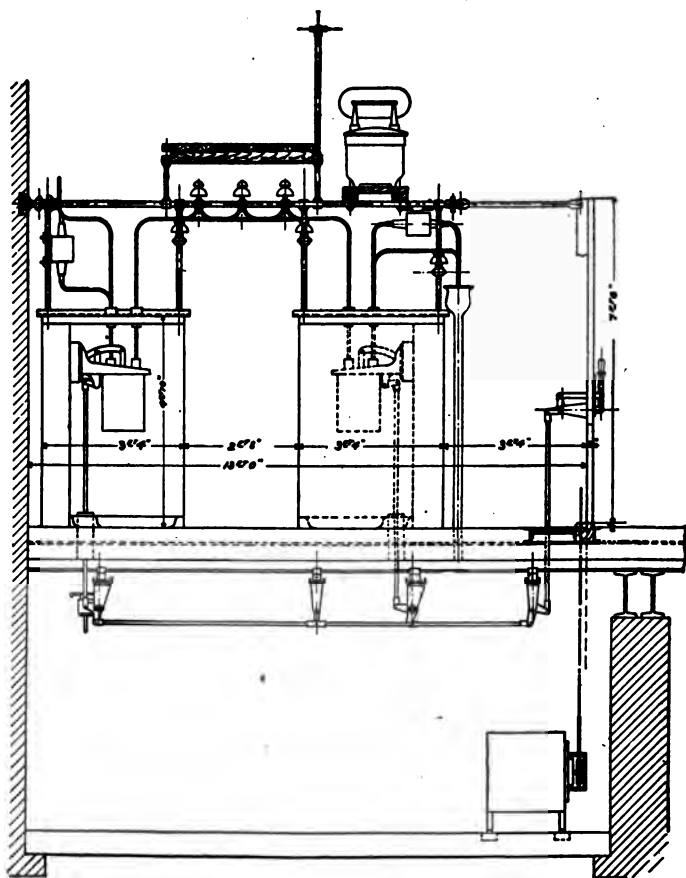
Arrangement of Remote Control Lever Oil Switches.
